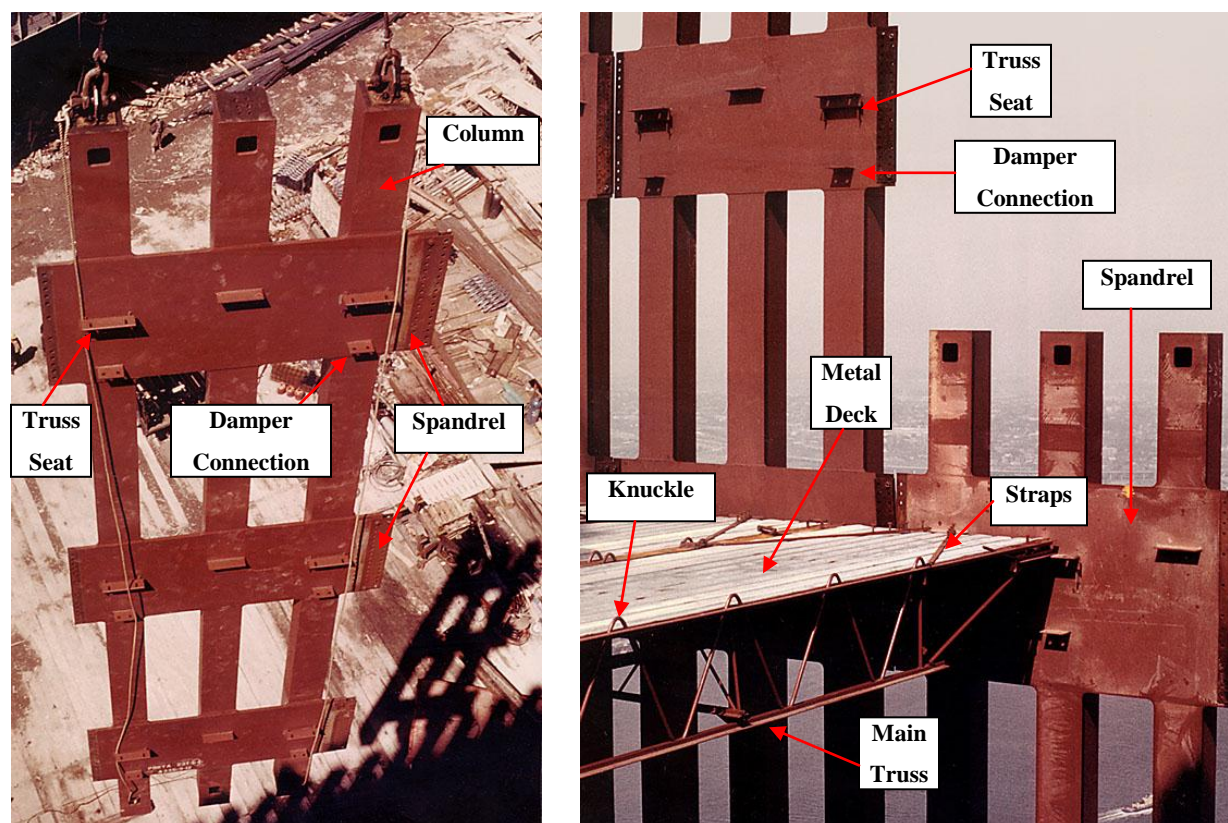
Perimeter column/spandrel assembly and floor structure [1].
